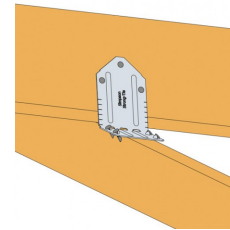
VTCR - View showing correct fastener installation into supporting truss
